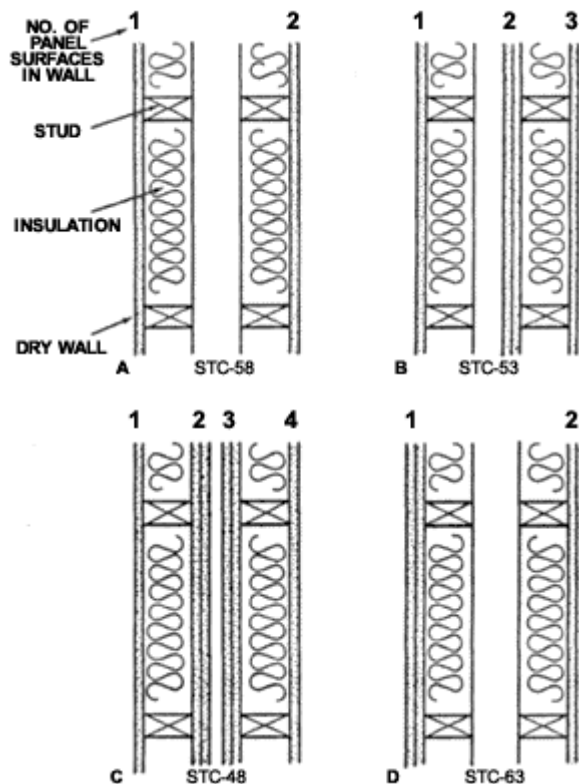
Plan view of a simple double stud partition (a). Adding drywall will actually lower the sound isolation if it creates a tribble (b) or quadruple (c) wall. A mass-airspace-mass arrangement offers the best use of materials and space. Additional drywall at the outer faces (d) increases attenuation dramatically.
